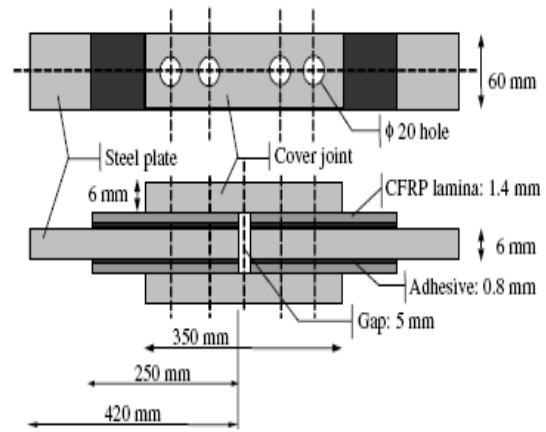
Bolted joint reinforcement (specimen B1 in Table 1).
